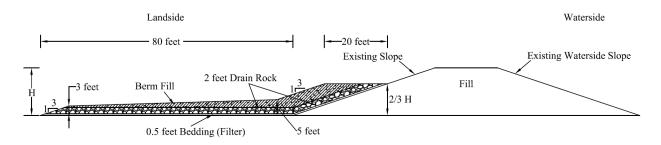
Typical USACE Seepage Berm Cross-Section Mid-Valley Sites
